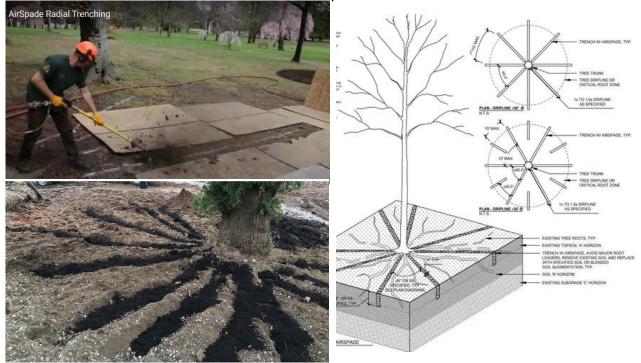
AirSpade courtesy of Pneumatic Soil Excavation Division of Guardair Corporation Chicopee, MA at: <u>https://www.airspade.com/blogs/educational-library/radial-trenching</u>
